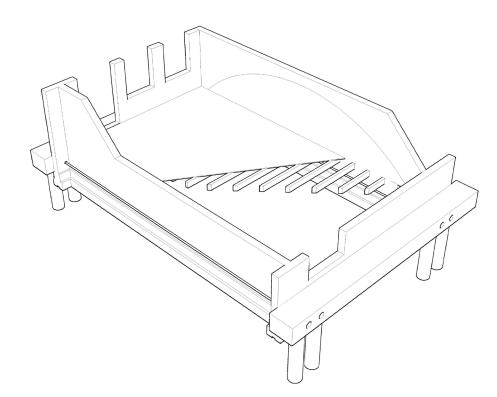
Concept design with structural modified masonry beam and post-tensioned cables (by author).
